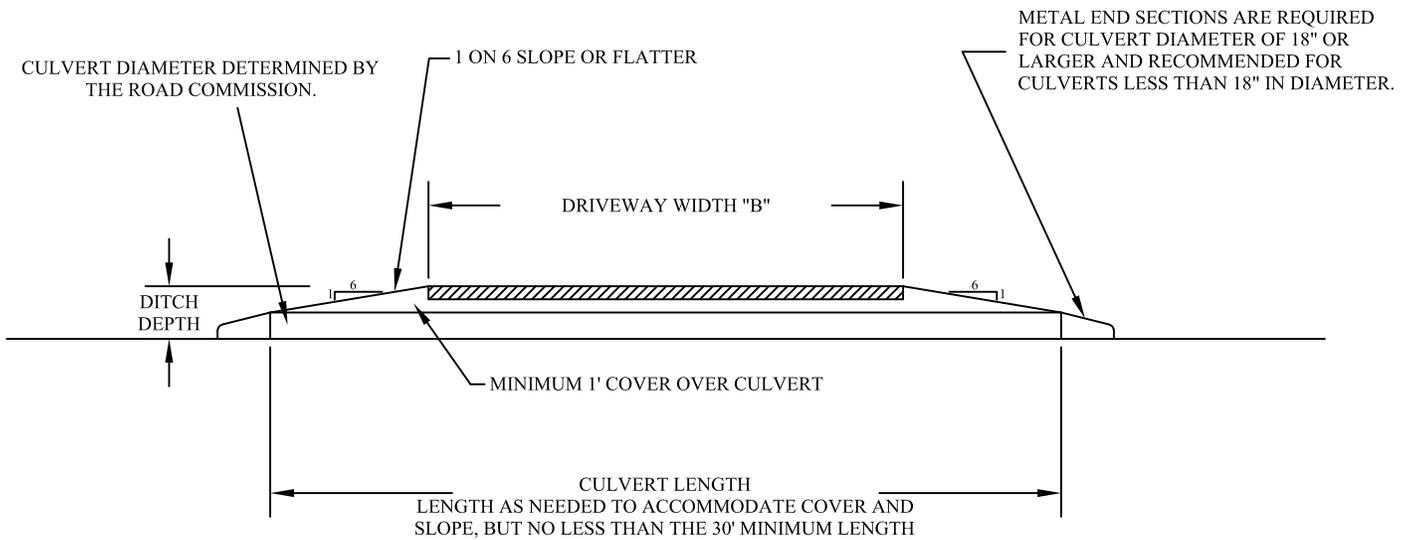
DRIVEWAY CROSS SECTION
